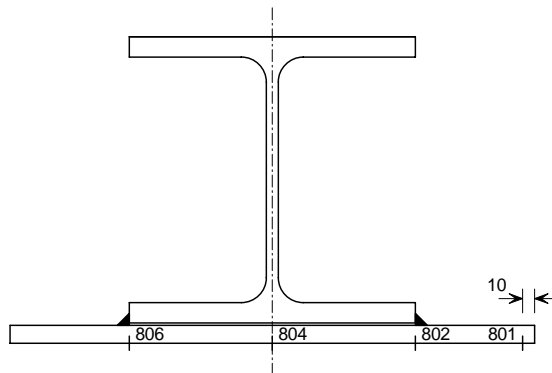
Edge beam transverse arrangement of thermocouples at position A
